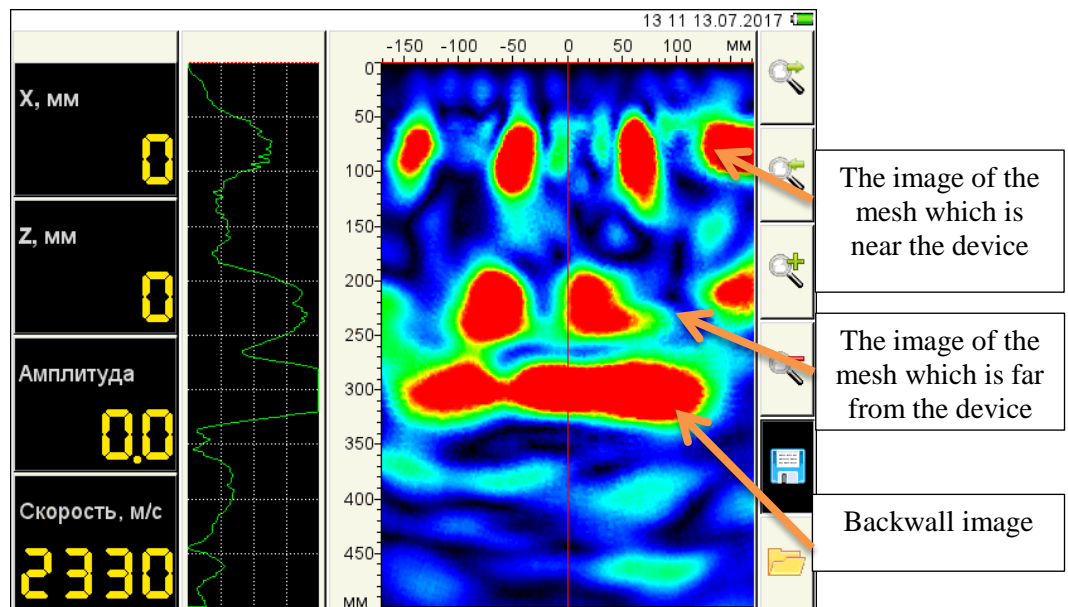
The tank wall scan with the reinforcement images and the backwall image.
